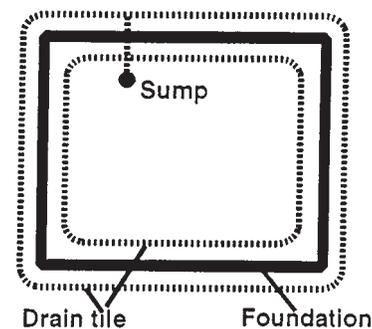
Example plan layout of drainage tile around foundation and below basement floor.
